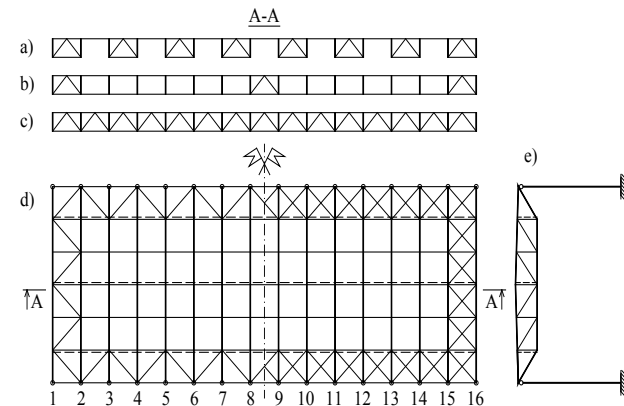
Truss bracings: a) discontinuous, in pairs, b) key lateral, c) continuous, coupling trusses, d) slope, e) spacing of bracings on the truss
